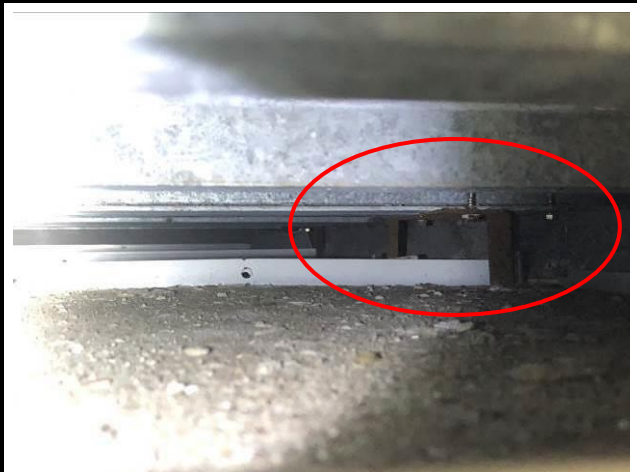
| Bracket connecting grid and access panel was rusty.
